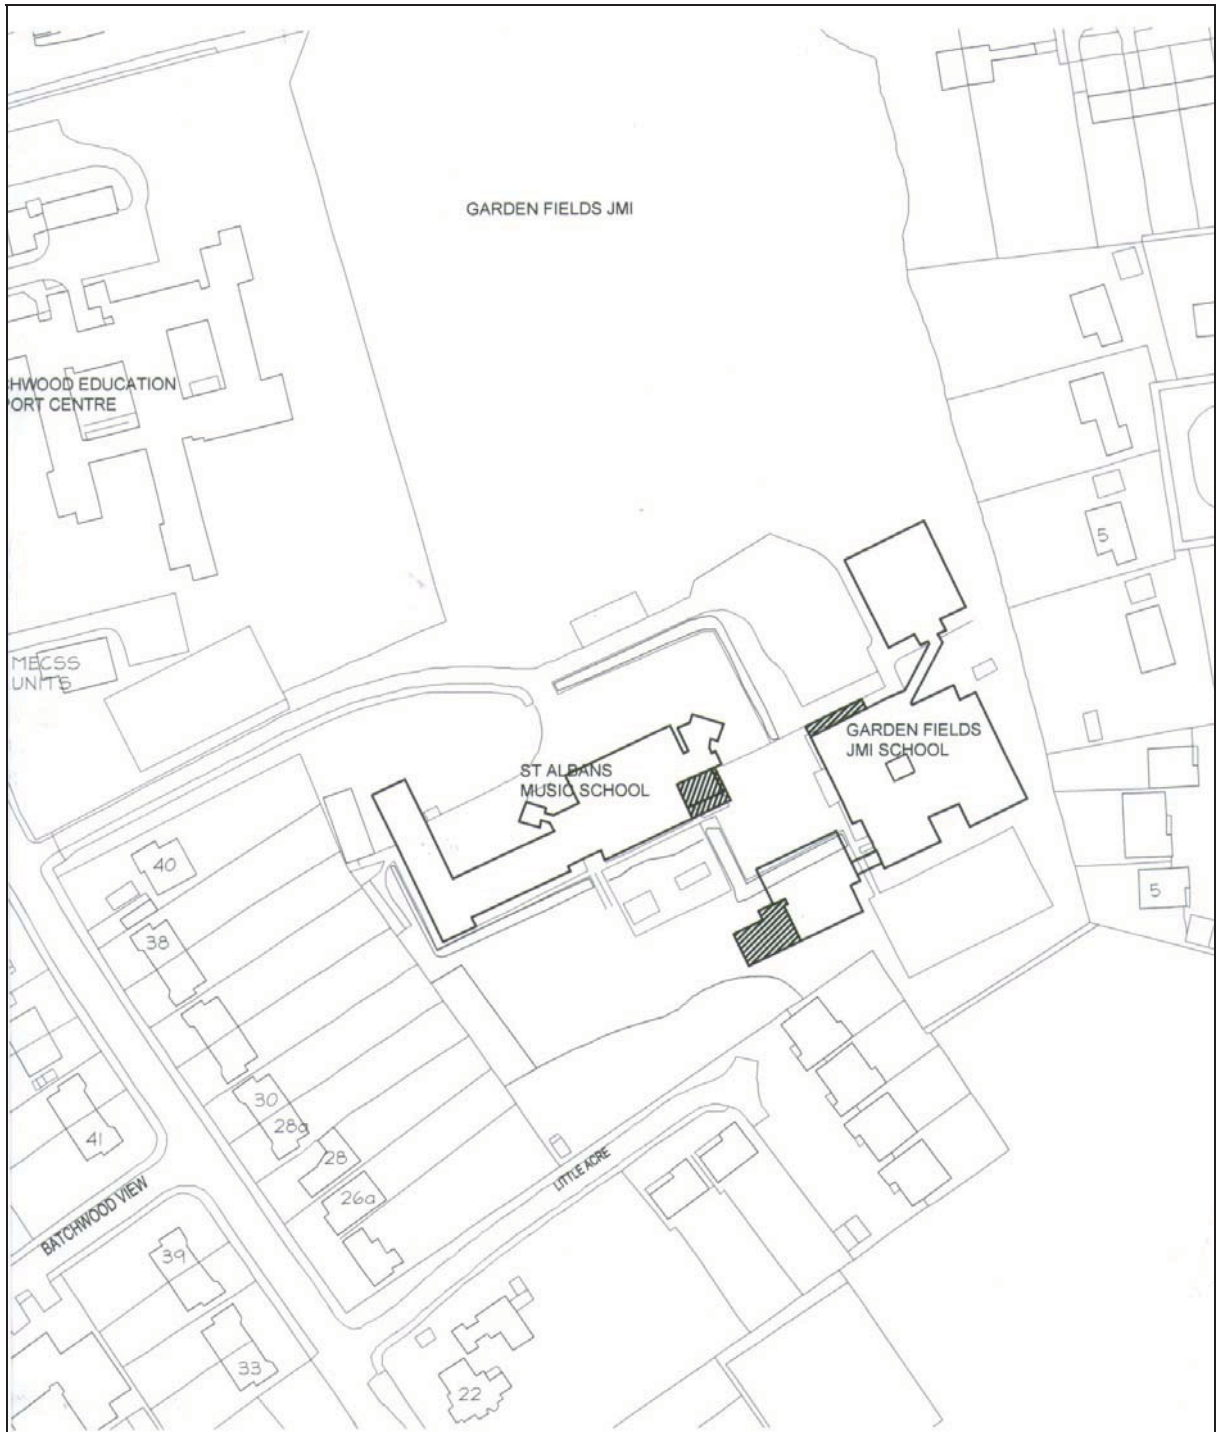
Site plan showing location of building extensions (shaded). Not to scale.
